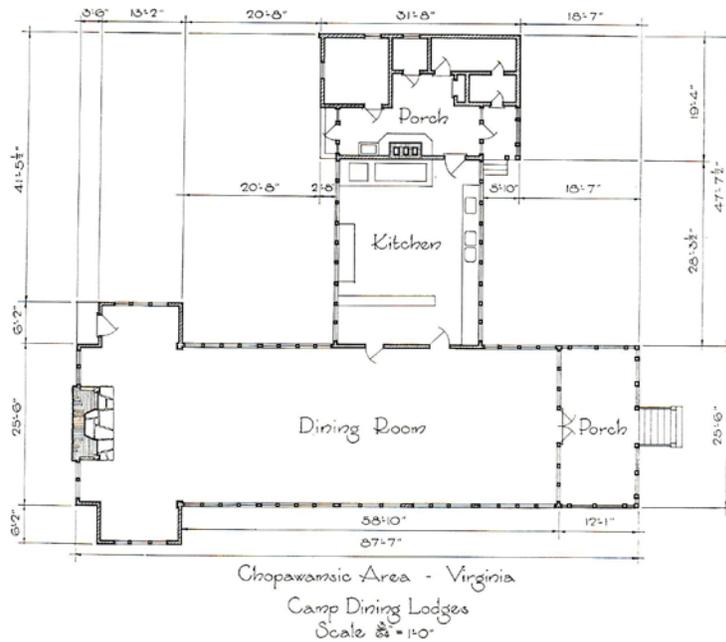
Chopawamsic RDA Dining Hall Floor Plan (Camp 2).
